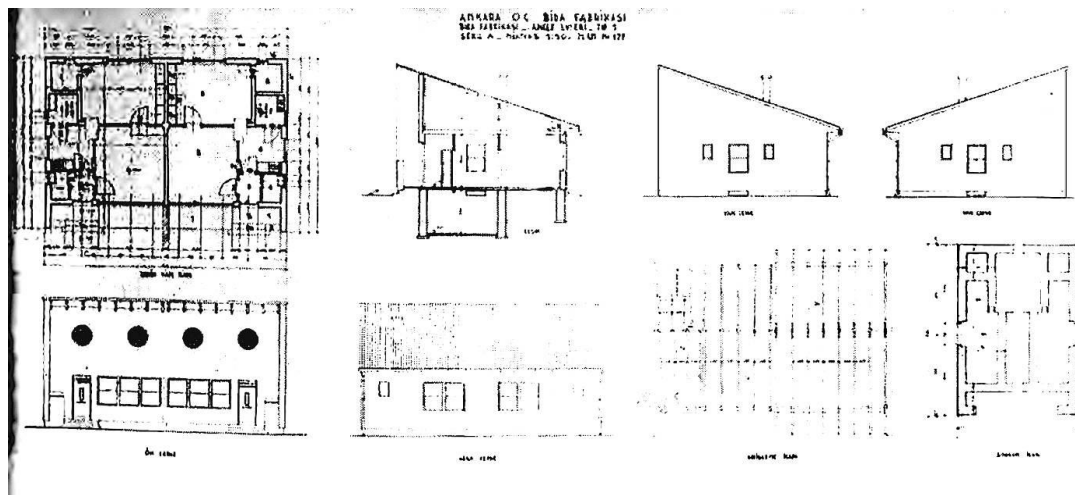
The drawings of the worker house (ALPAGUT,2010:252)
